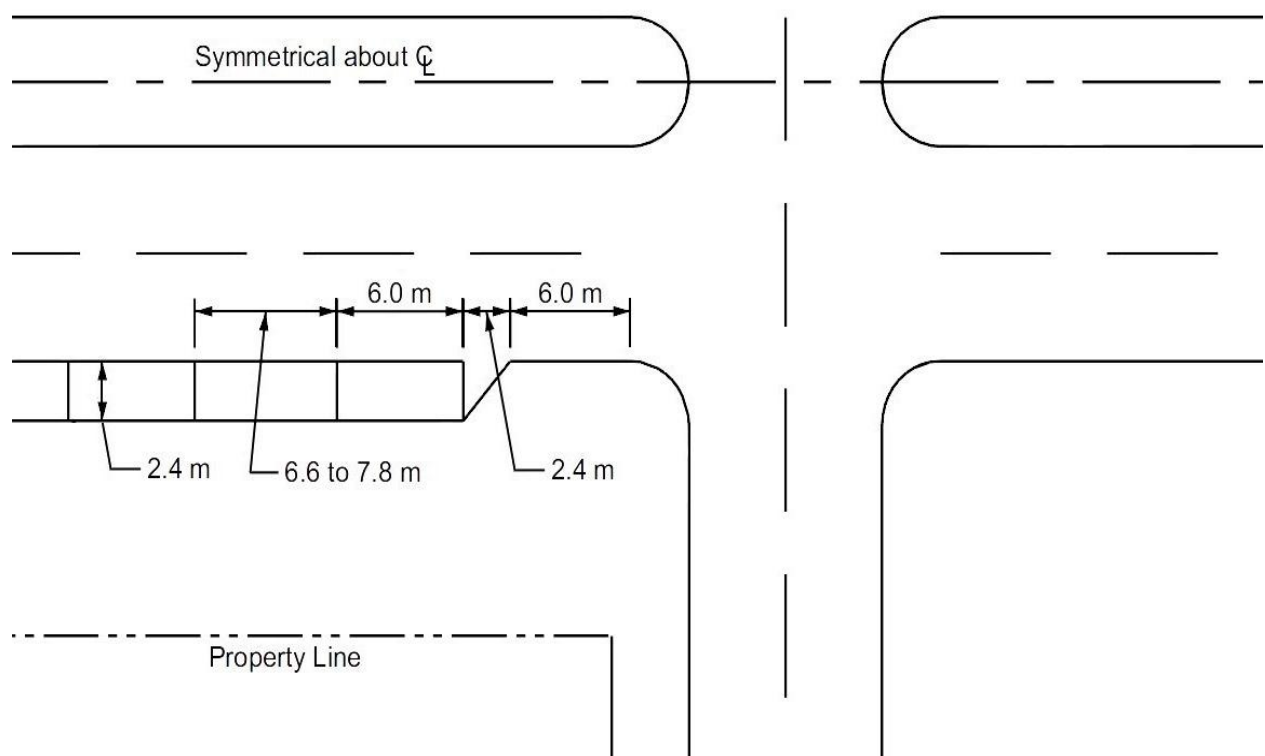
/1: Parking Lane Transition at Unsignalized Intersection [1, p.4-74]
